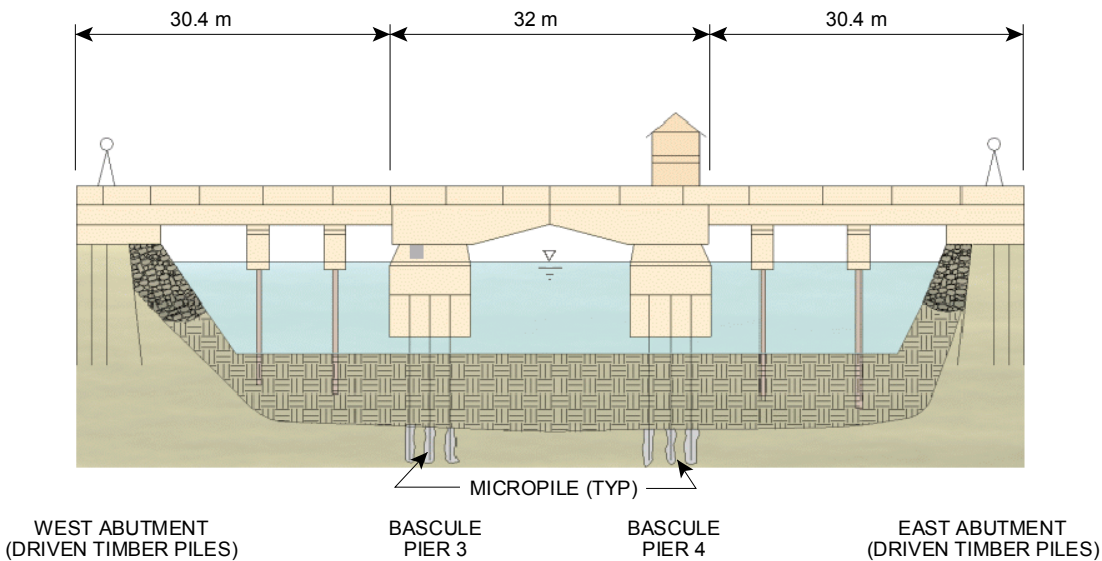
Underpinning Arrangement for Pocomoke River Bridge, Maryland (after Bruce et al., 1990).
